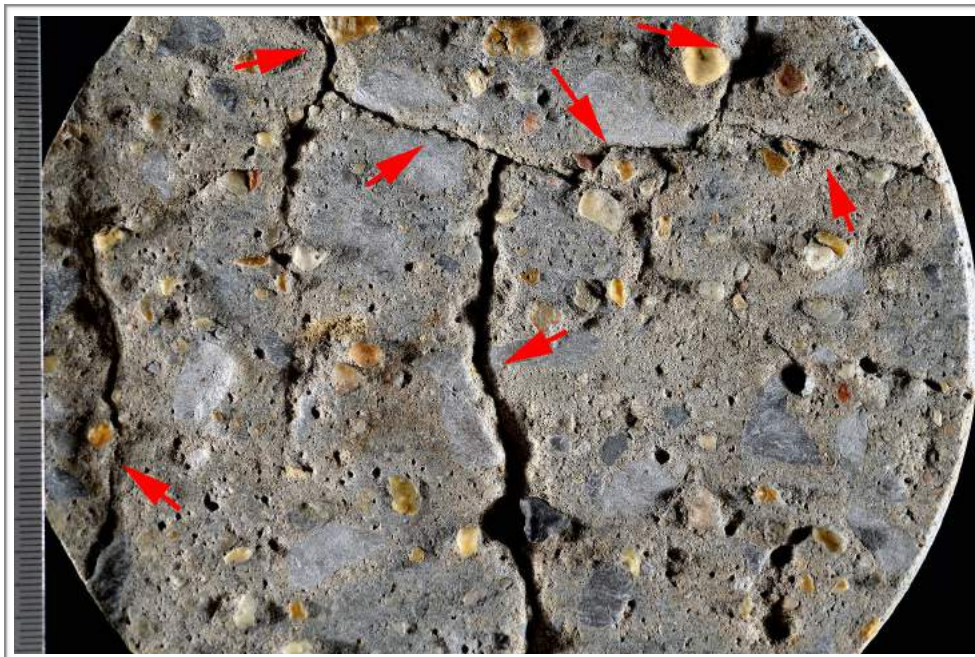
Photograph of top of core showing cracks (red arrows); scale in millimeters.
